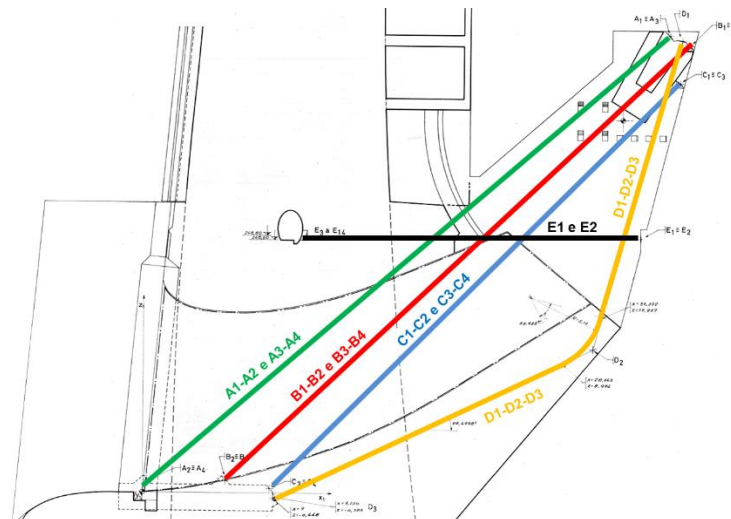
Elevation of the prestressing tendons connecting the spillway structures to the dam's body
